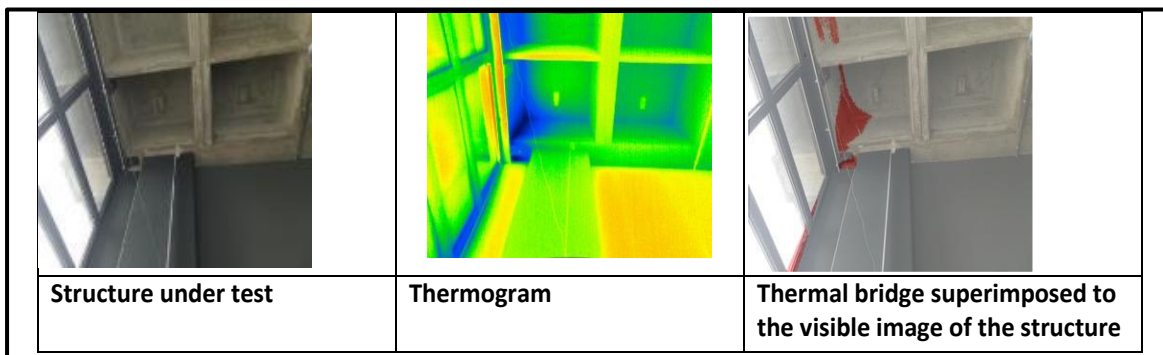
Zoom on a thermal bridge in the right corner of the ceiling of a room
